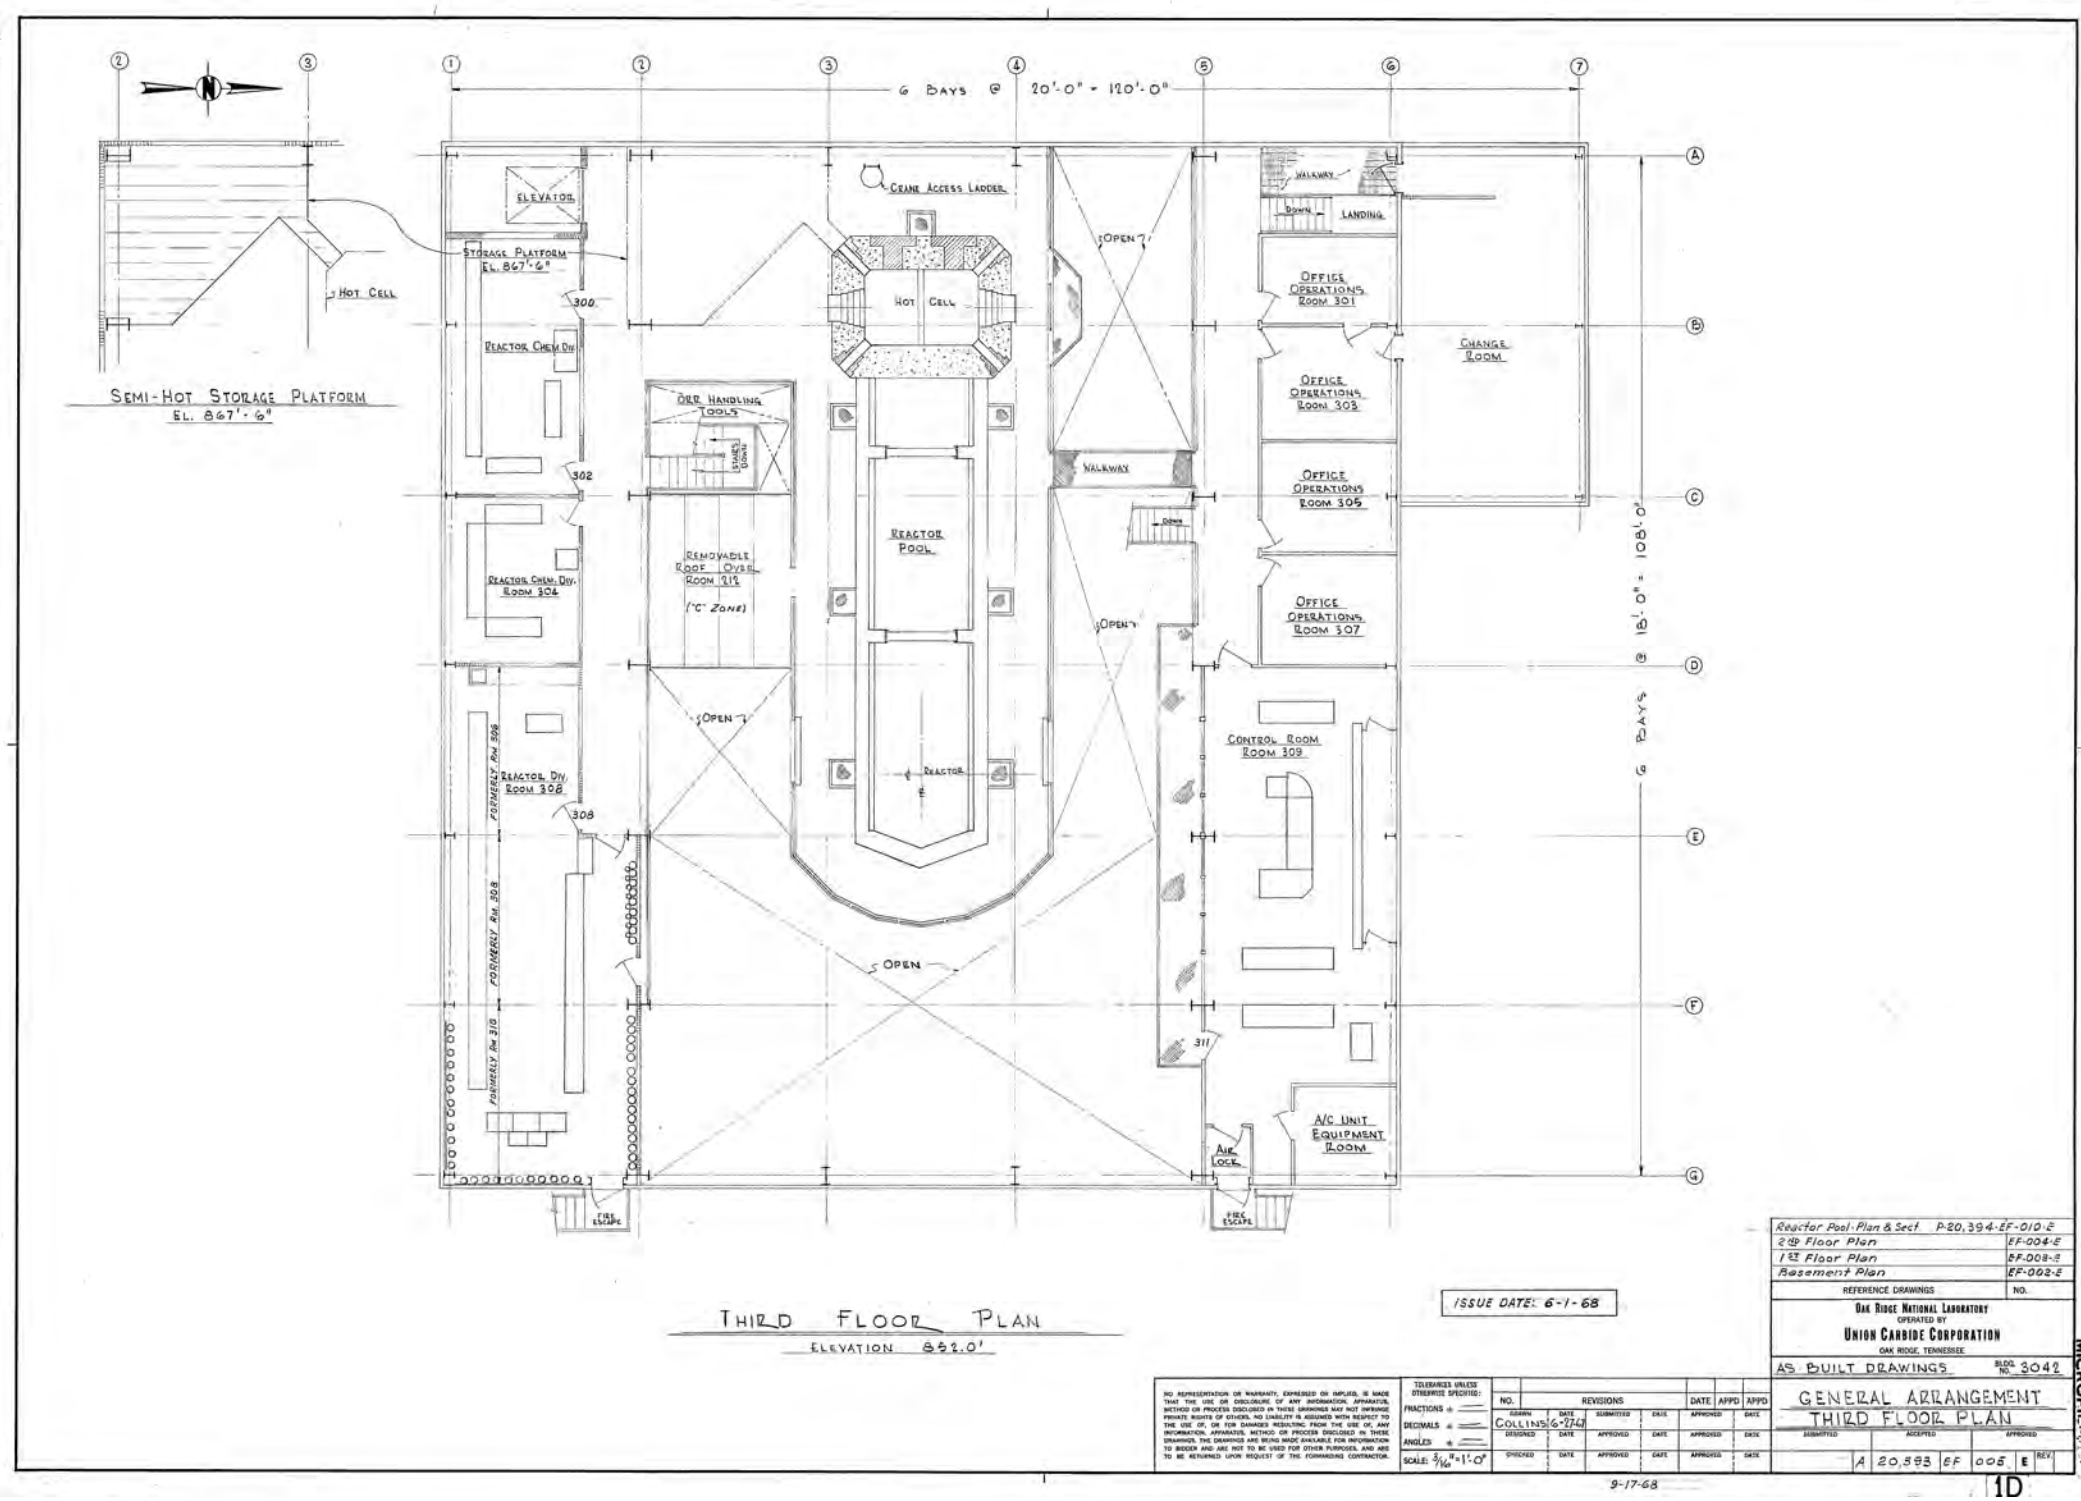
As built drawing showing the general arrangement of the third floor plan in Building 3042 (Oak Ridge National Laboratory, June 27, 1967 [drawn date], June 1, 1968 [issue date, with revisions]).
